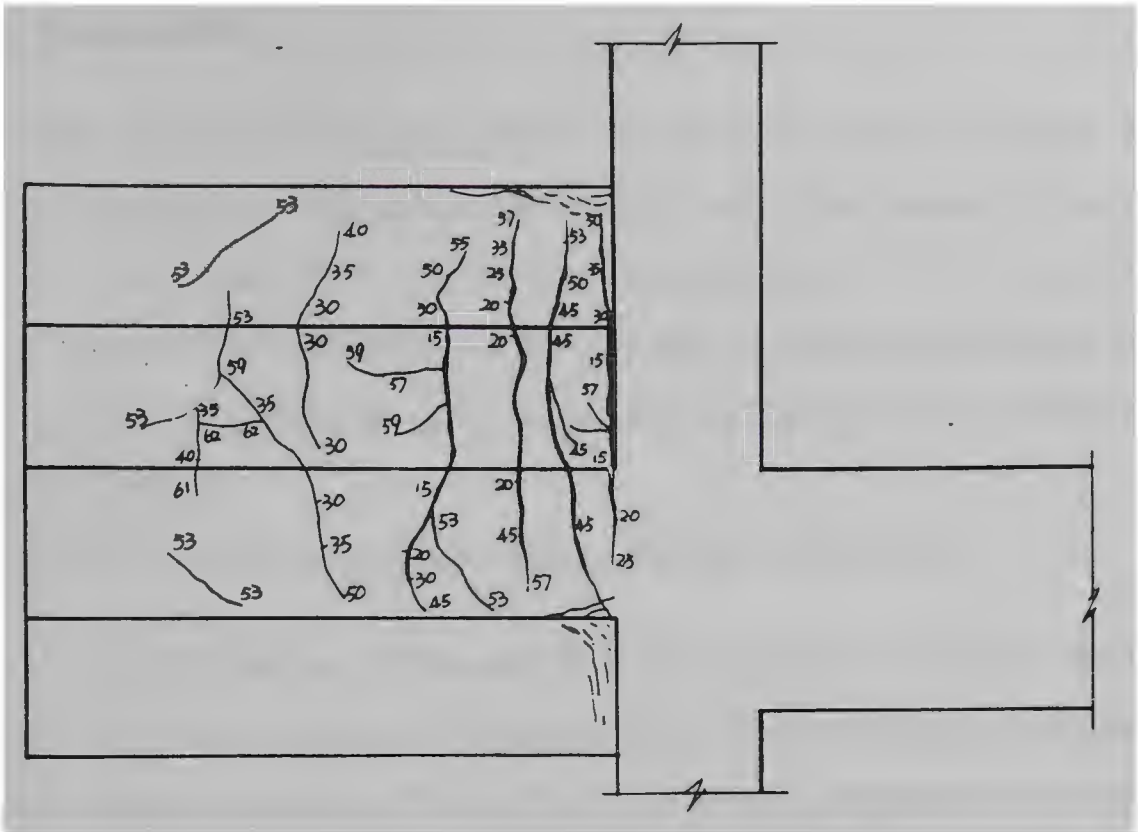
Crack Pattern for Specimen SPA2
